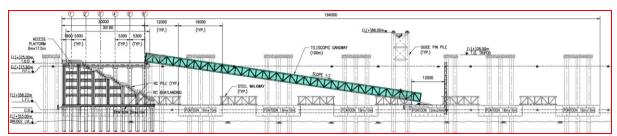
Longitudinal section of Berthing facility at Low Flood level (+) 58.22m CD
